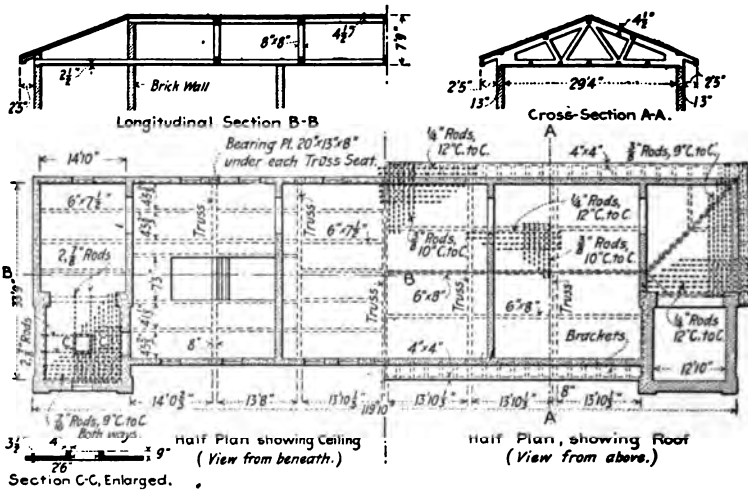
Plan of Roof Used at Atlanta, Ga., Terminal Station.
